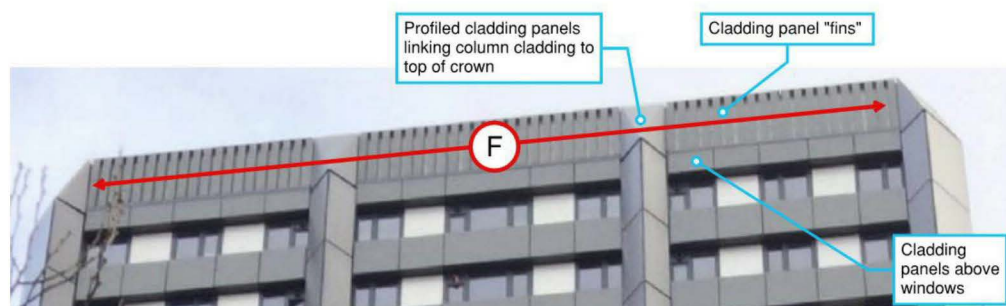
Pathway F identified on undamaged façade (SEA00000322)
